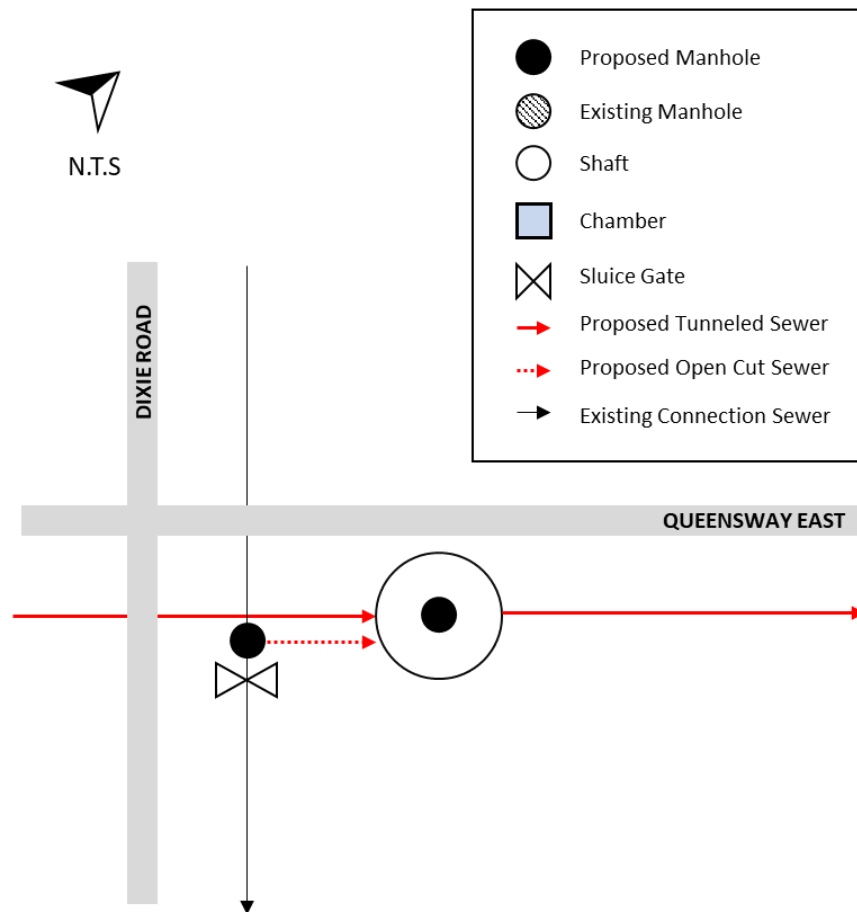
Queensway East and Dixie Road Connection Type Schematic
